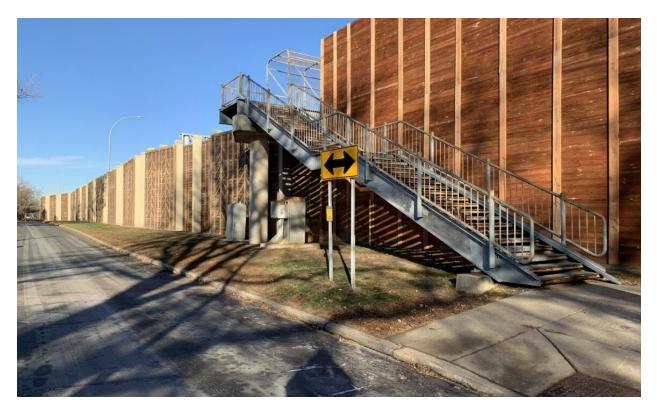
Stairs on the west side of existing Bridge #9888 over I-35W (Nov 2023). Photo Credit: City of Richfield
